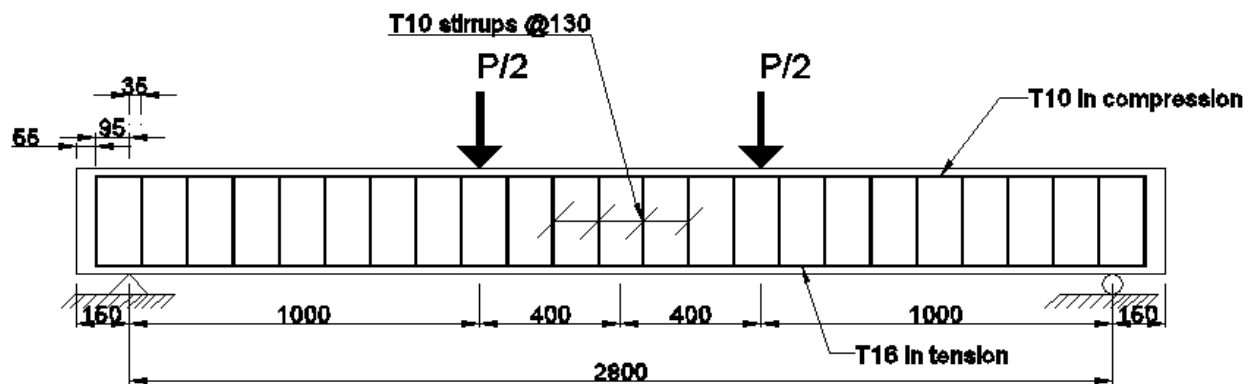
Detailing of the reference beam (modified Sin, 2011)
